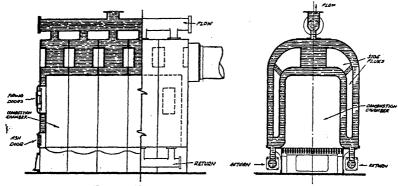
Typical Steel Sectional Boiler (Paxman).
